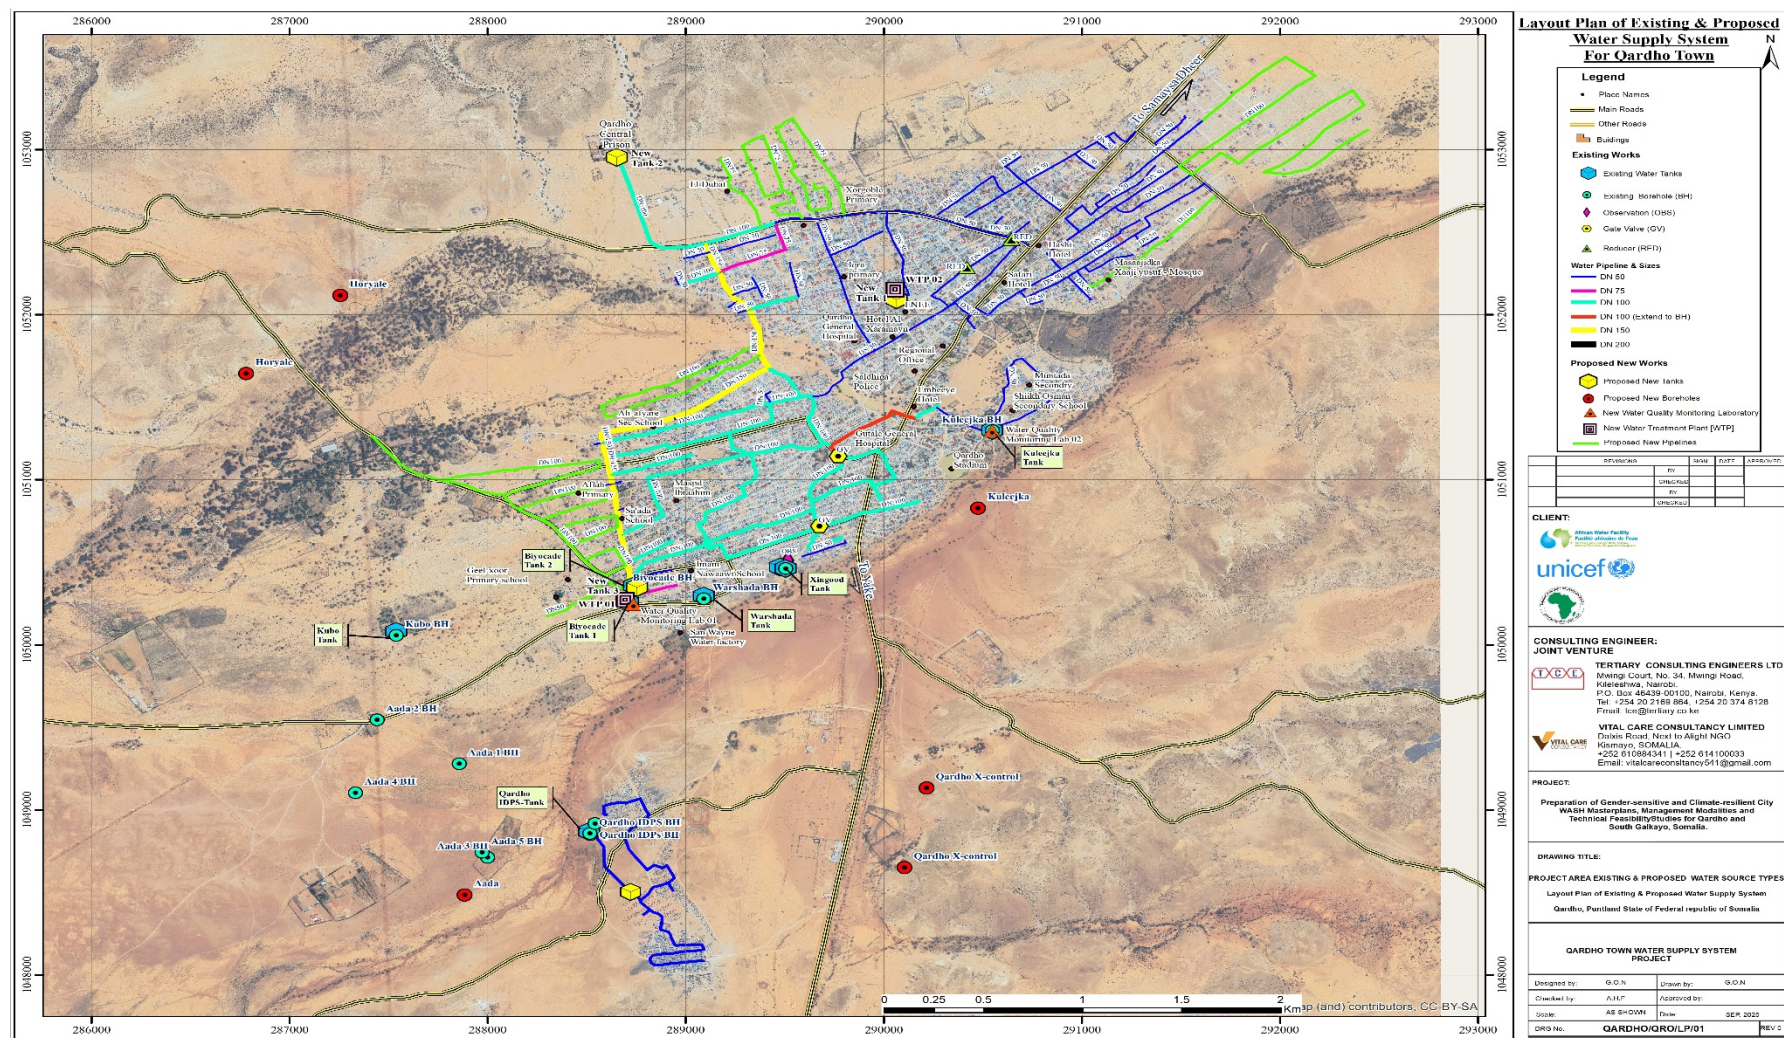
Layout of the Project Area with the Existing and Proposed Water treatment projects
